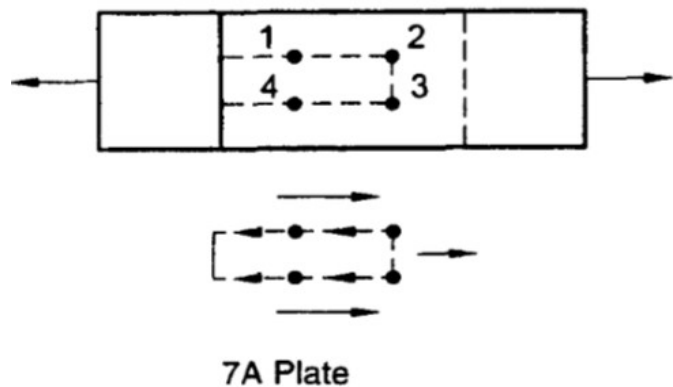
PLATES WITH BOLTS HOLES IN TENSION
